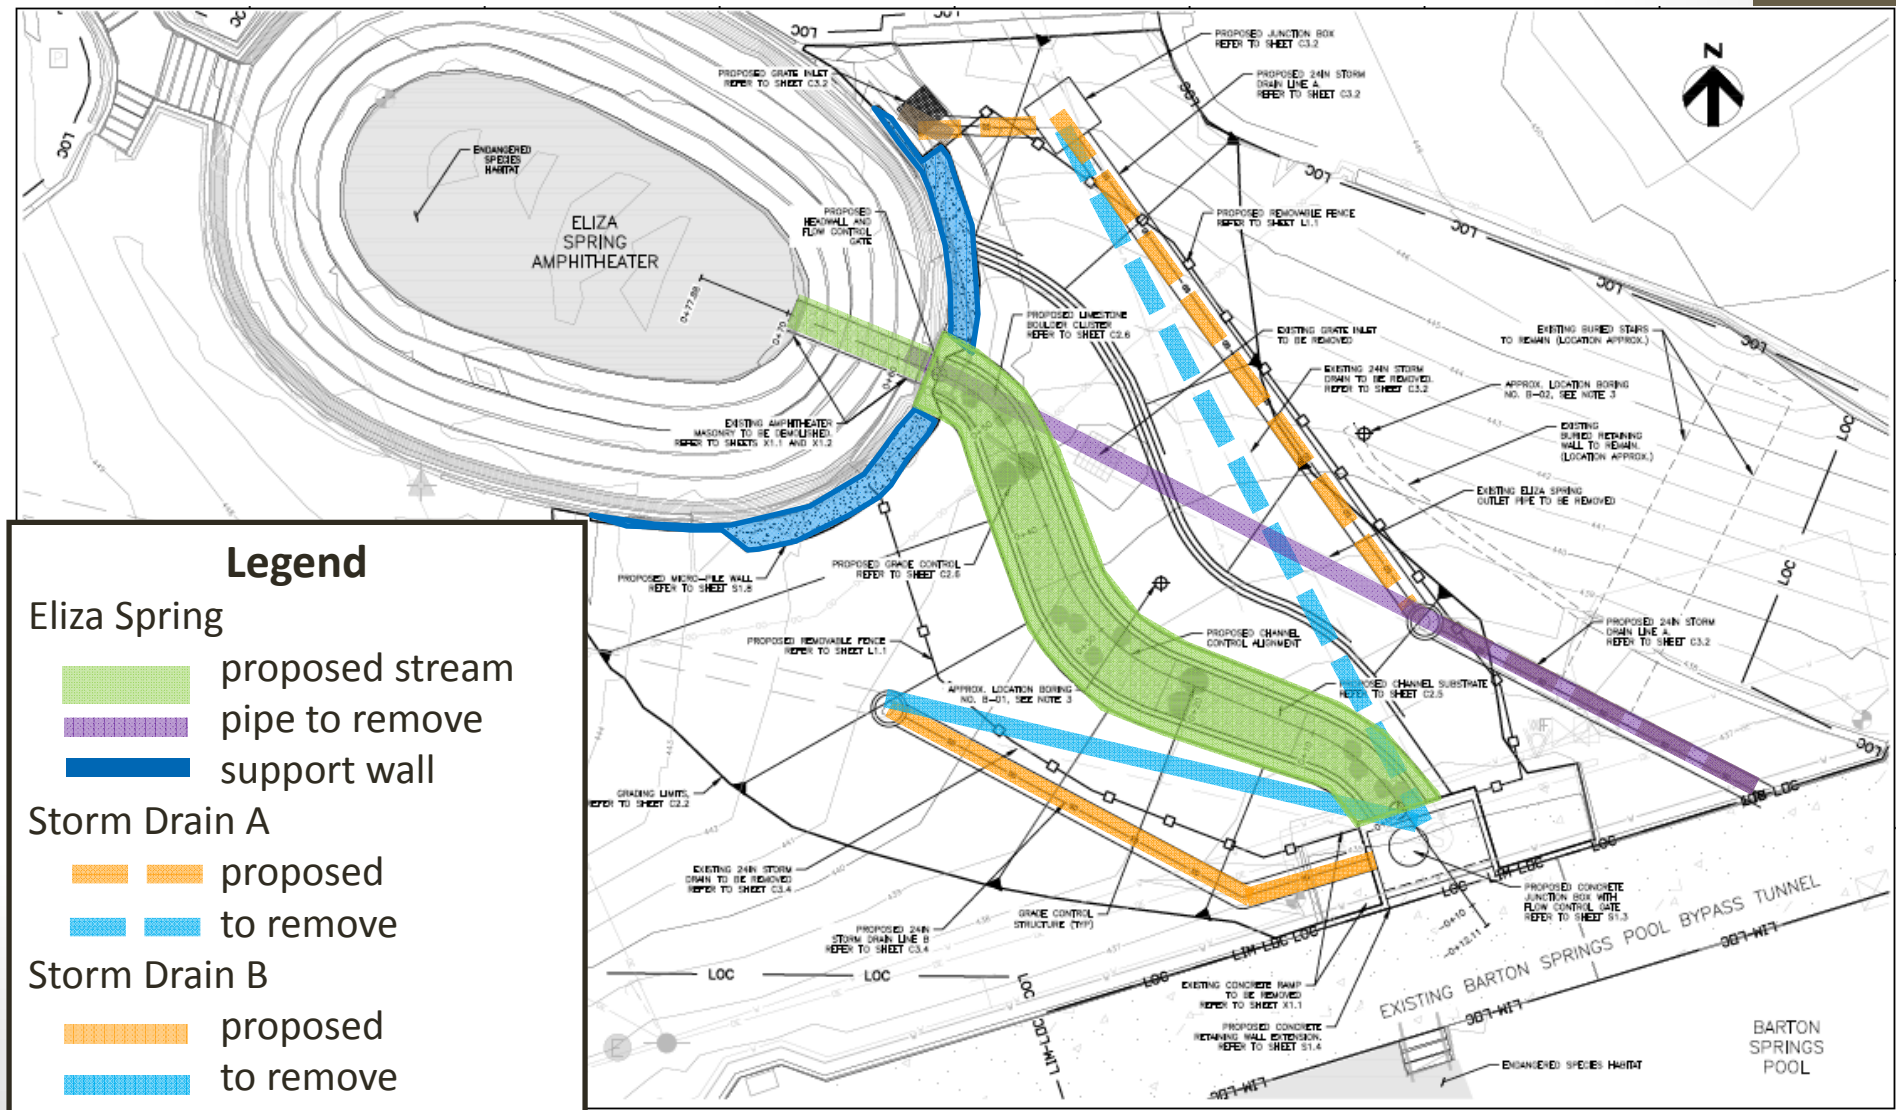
Exhibit B: New Channel, Storm Drain Redirection, and Structural Support
